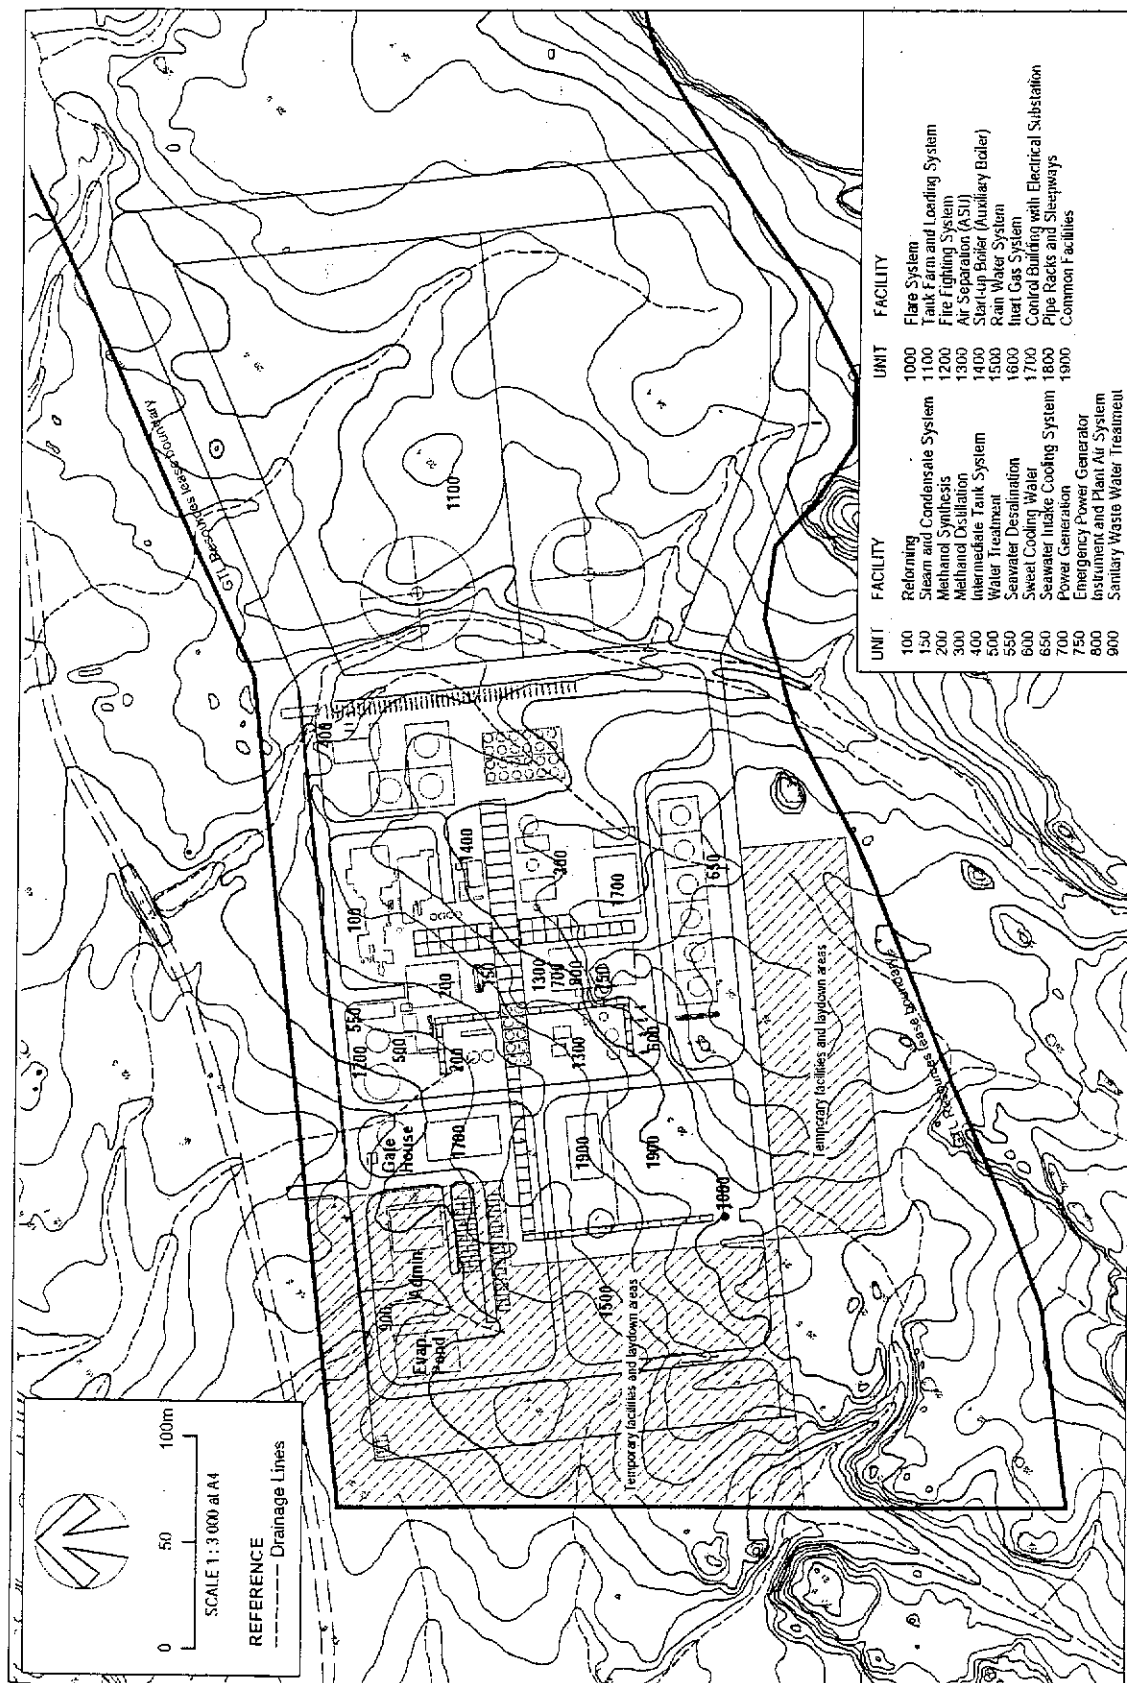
Site layout plan (Source: URS, 2002, amended Figure 4)
